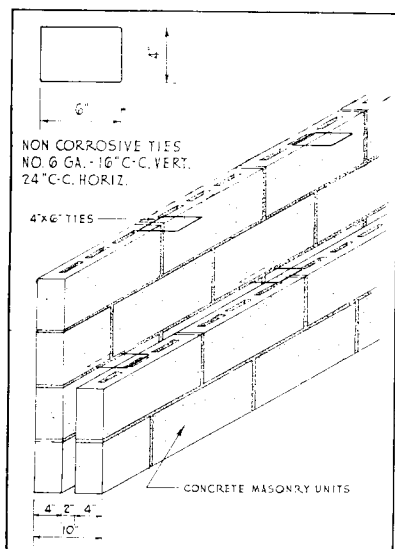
Hollow double concrete-masonry wall construction, approved by F. H. A., consists of two 4-in. hollow concrete-masonry walls, separated by a 2-in. air space, and tied with a closed rectangular tie of No. 6-gage rust-resisting or rust-protected wire, spaced 24 in. horizontally and 16 in. vertically.
